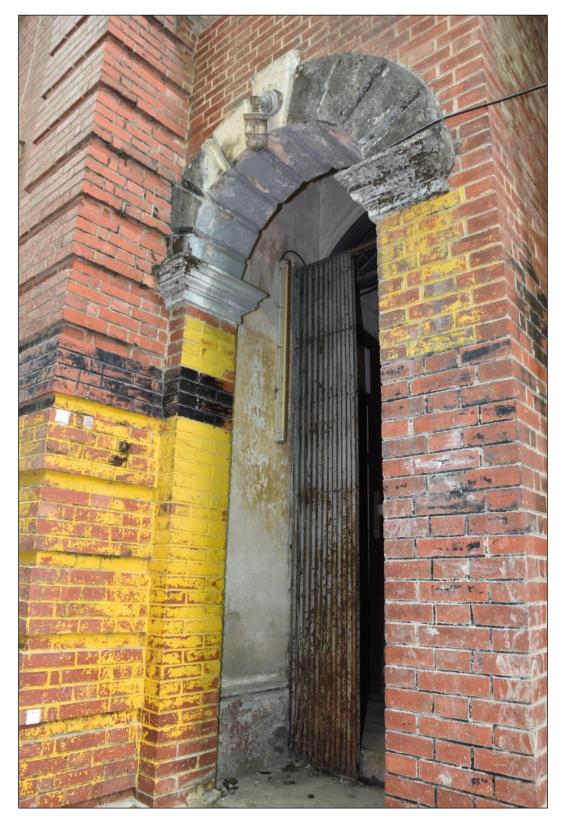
Main Building main facade, (8<sup>th</sup> October, 2024)
